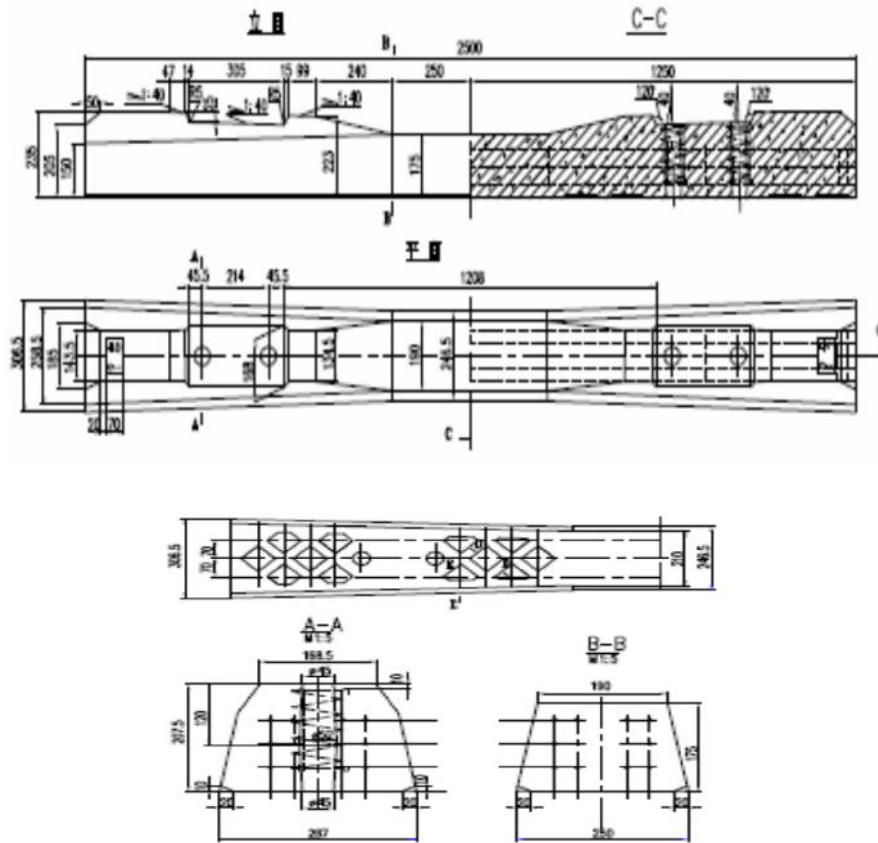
Sleeper section for national railway network of Ethiopia (Source: ERC)
